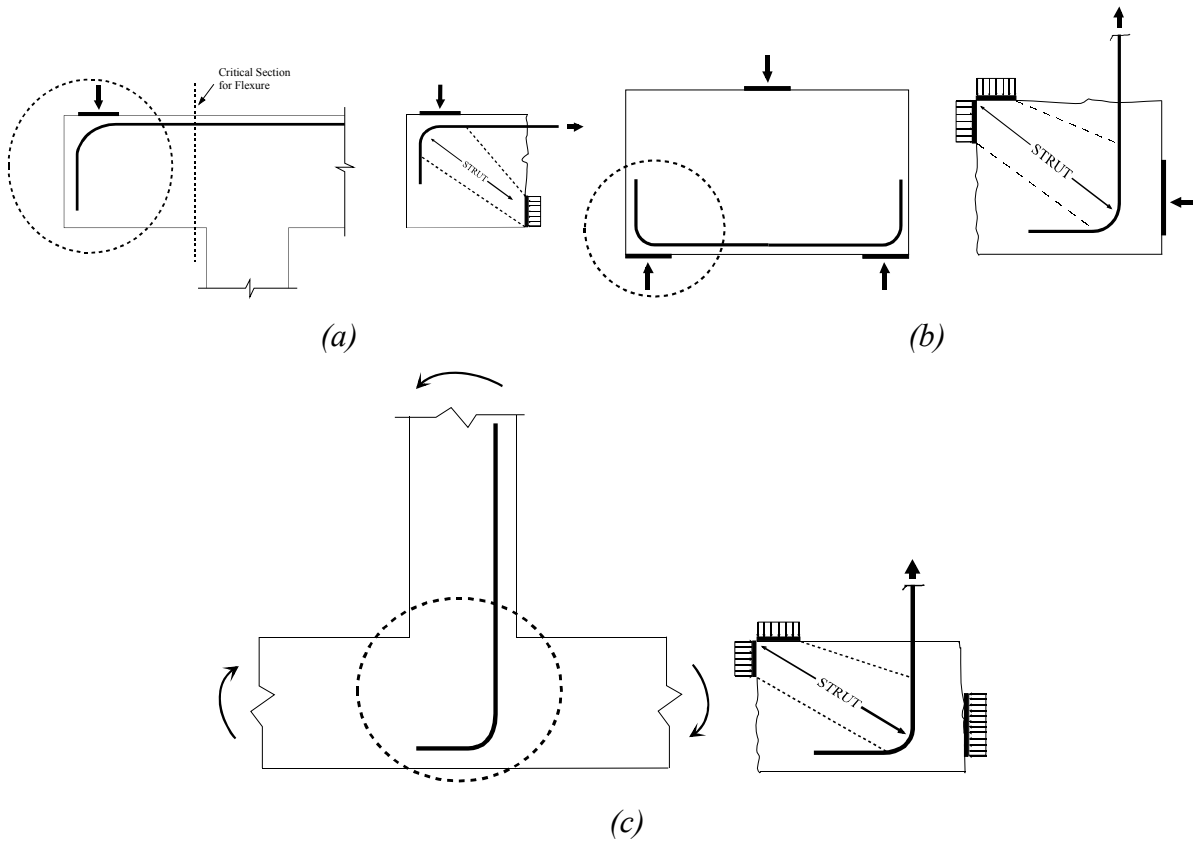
Schematic and strut and tie model of typical uses of a standard hook anchorage F.B.D (a) Pier Cap, (b) Deep Beam, and (c) Retaining Wall.
